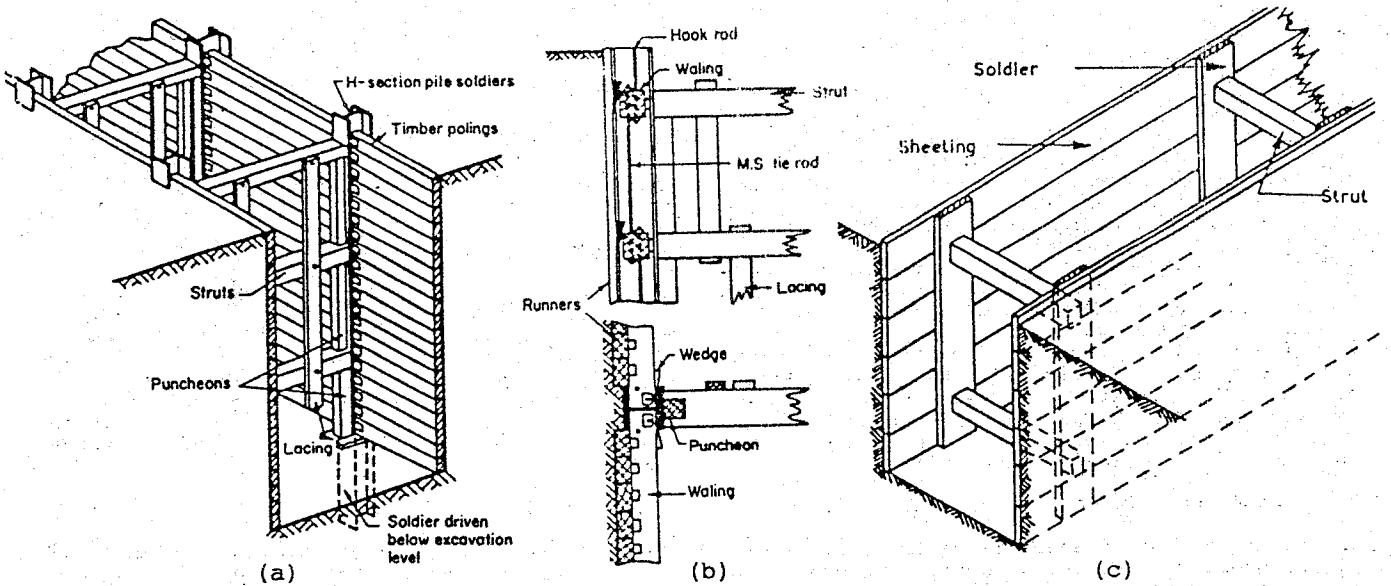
Soldier piles with cross timbering H-sections with (a) polings, (b) runners, (c) timber soldiers with sheetings
